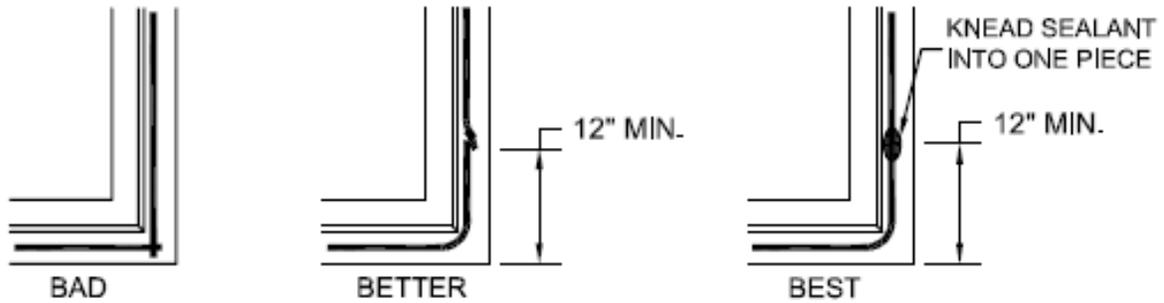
Best Practices on Connecting Sealant (Courtesy of Concrete Sealants Inc.)
